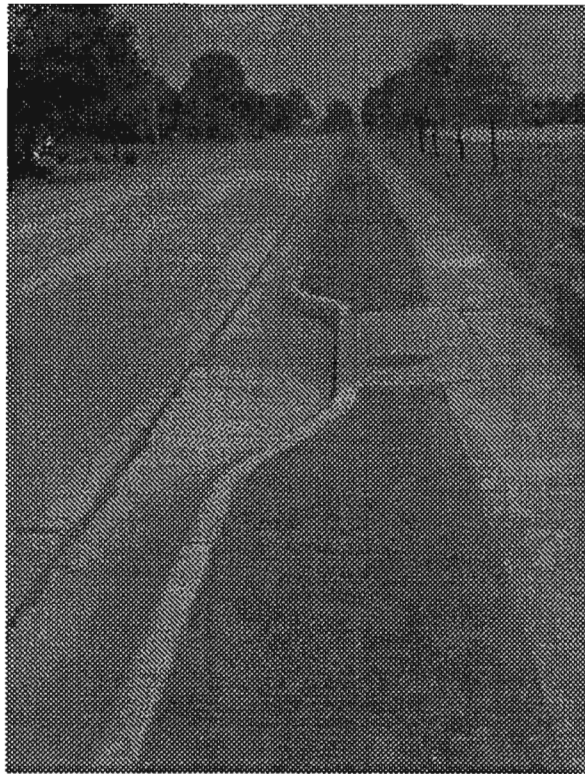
A Recessed Inlet that does not Encroach on the Sidewalk Space
